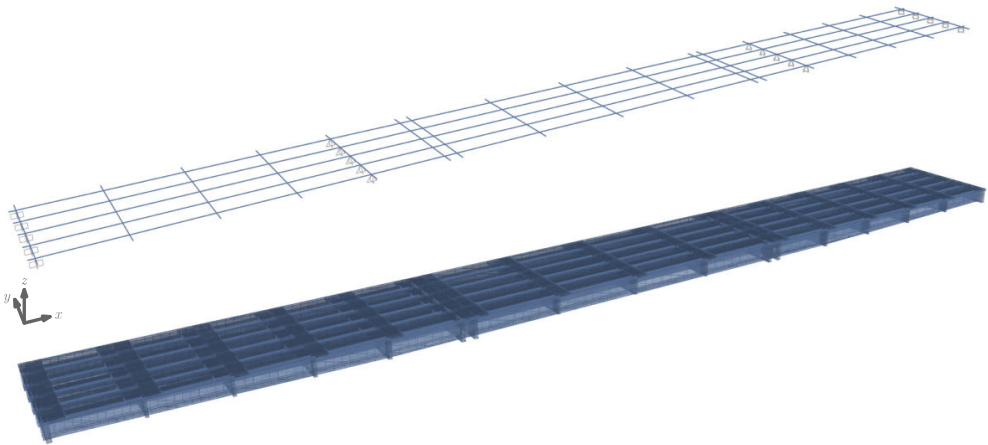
FE model of the bridge deck using beam elements with collaborating portion of RC slab: standard view (top) and extruded view (bottom).
